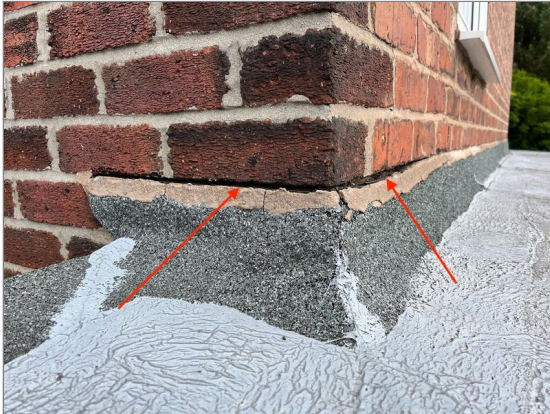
Pointing required at junction of flat roof upstand and main walls.
